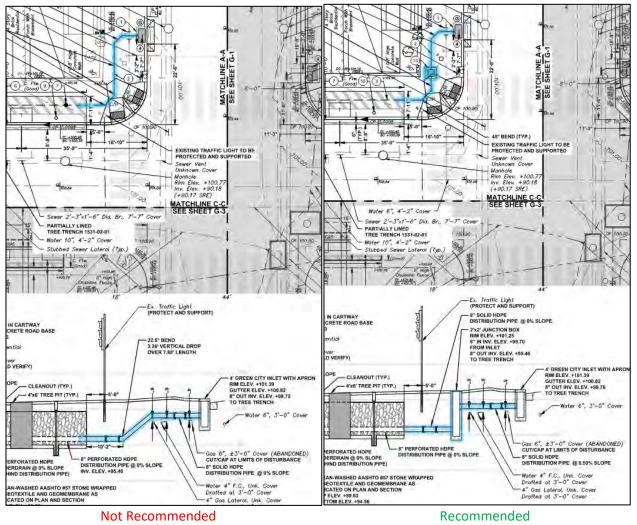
Use of a junction box to change pipe elevation and provide additional maintenance access to alternating bends.
